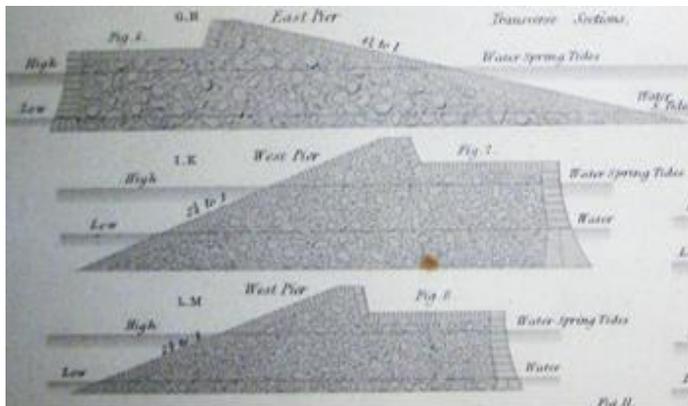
Rennie’s sections through the slant piers (East and West), built à pierre perdue before the introduction of the bell.
